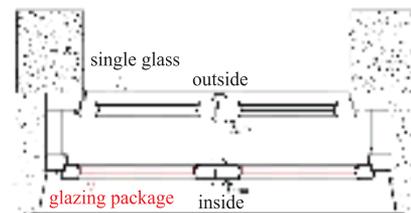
Horizontal section of the window – window frame with an additional panel (Type 2)
